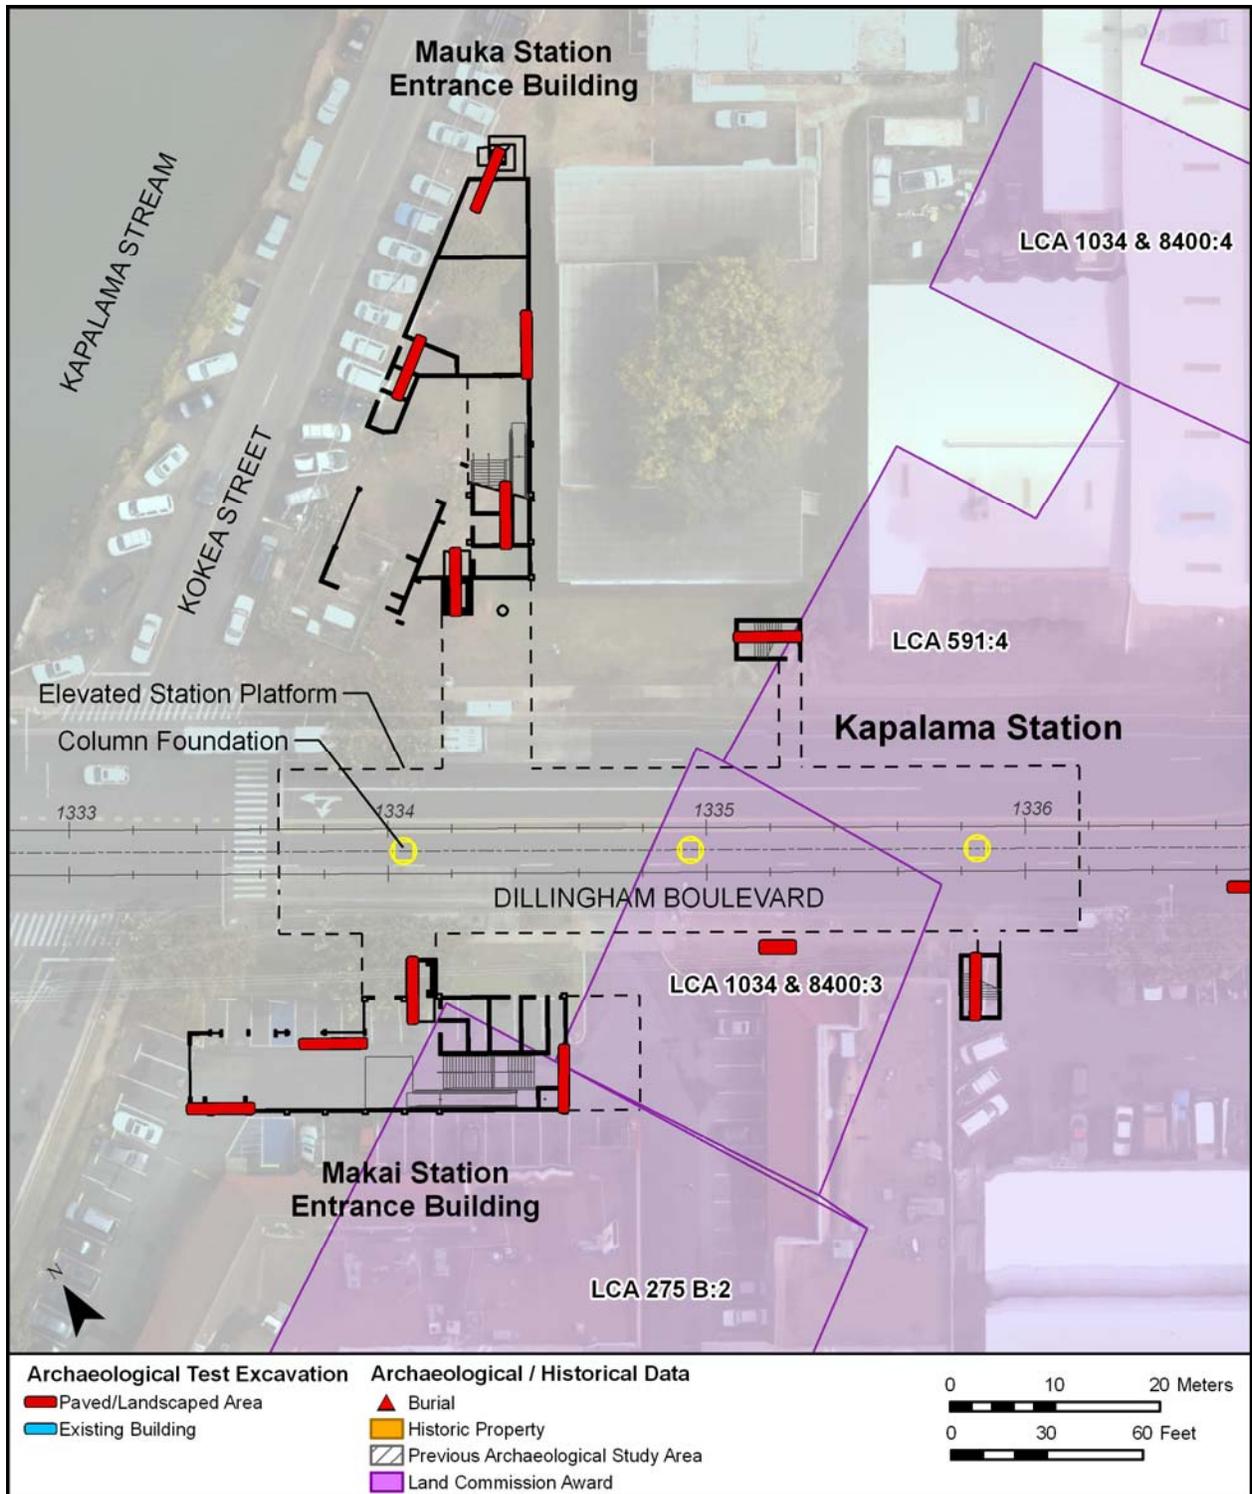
Kapalama Station (Dillingham Boulevard just east of Kokea Street and *makai* of Honolulu Community College), aerial photograph showing overlay of transit station infrastructure (see following figures for details)
